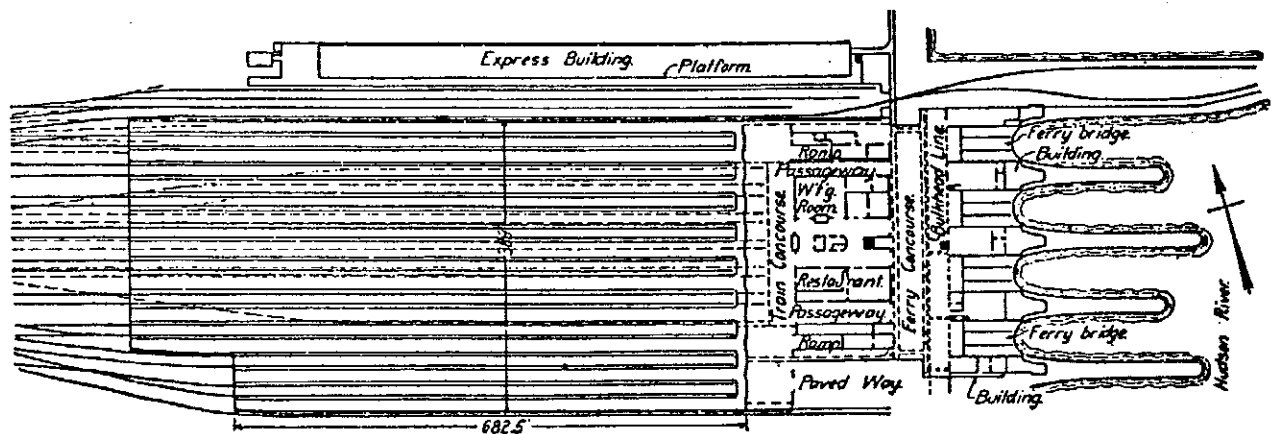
Layout of Jersey City Station, Central of New Jersey.
